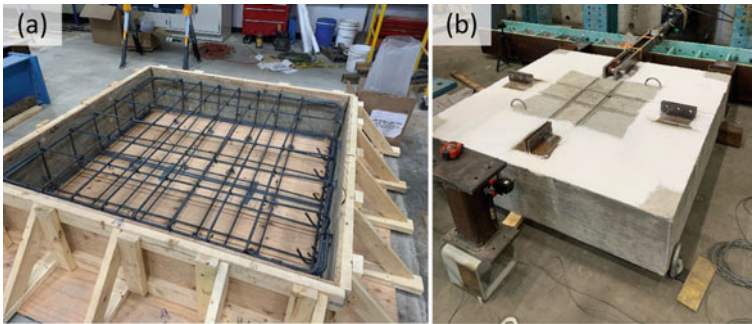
a Reinforcement cage prior to embed placement and concrete pour, b Cast block
